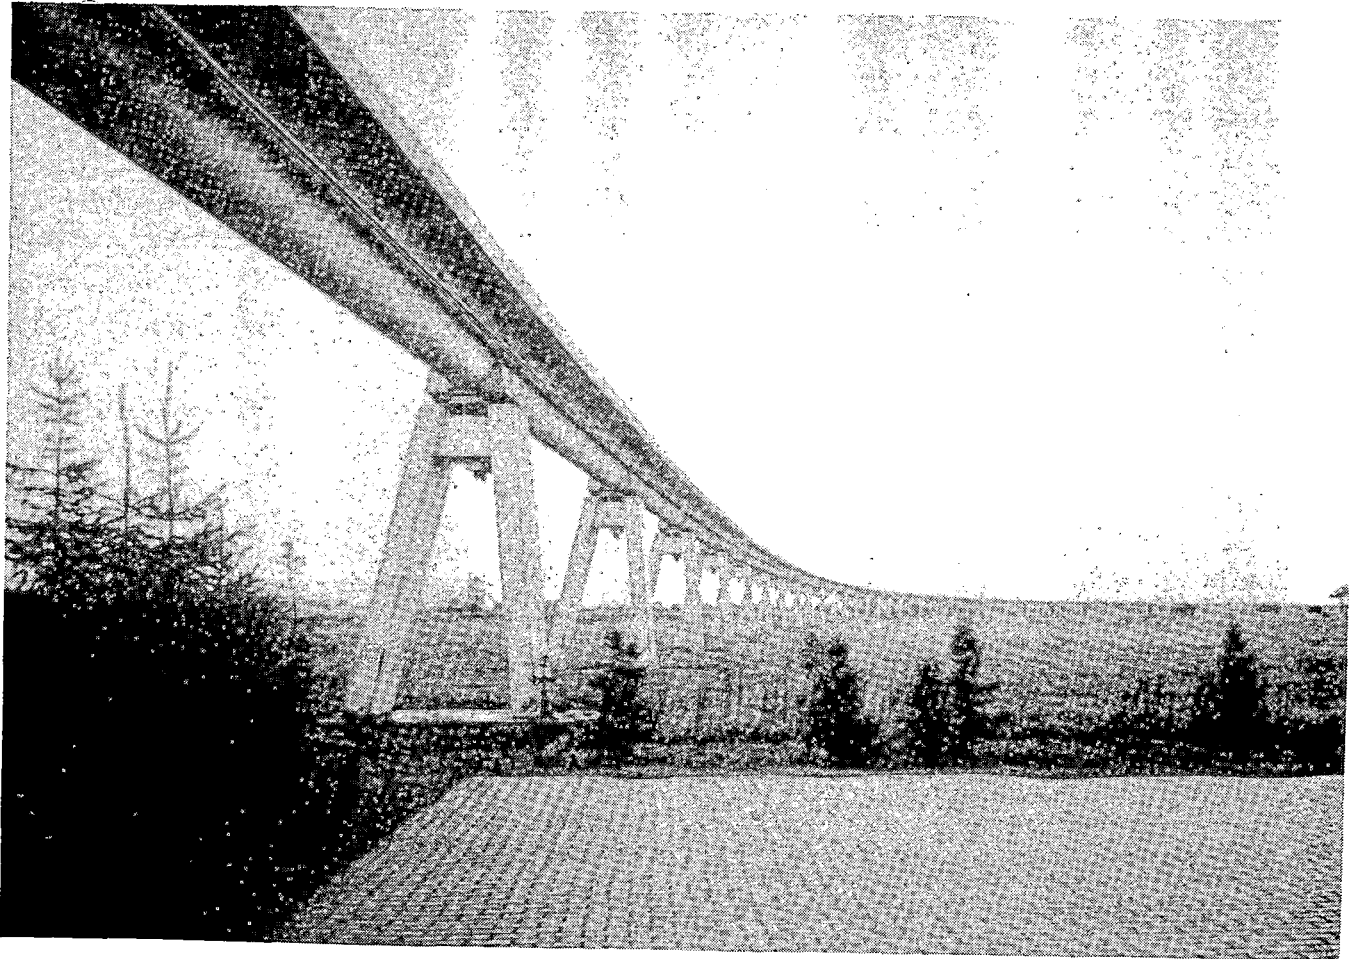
Photograph of Concrete Guideway at Emsland Test Track, Germany
